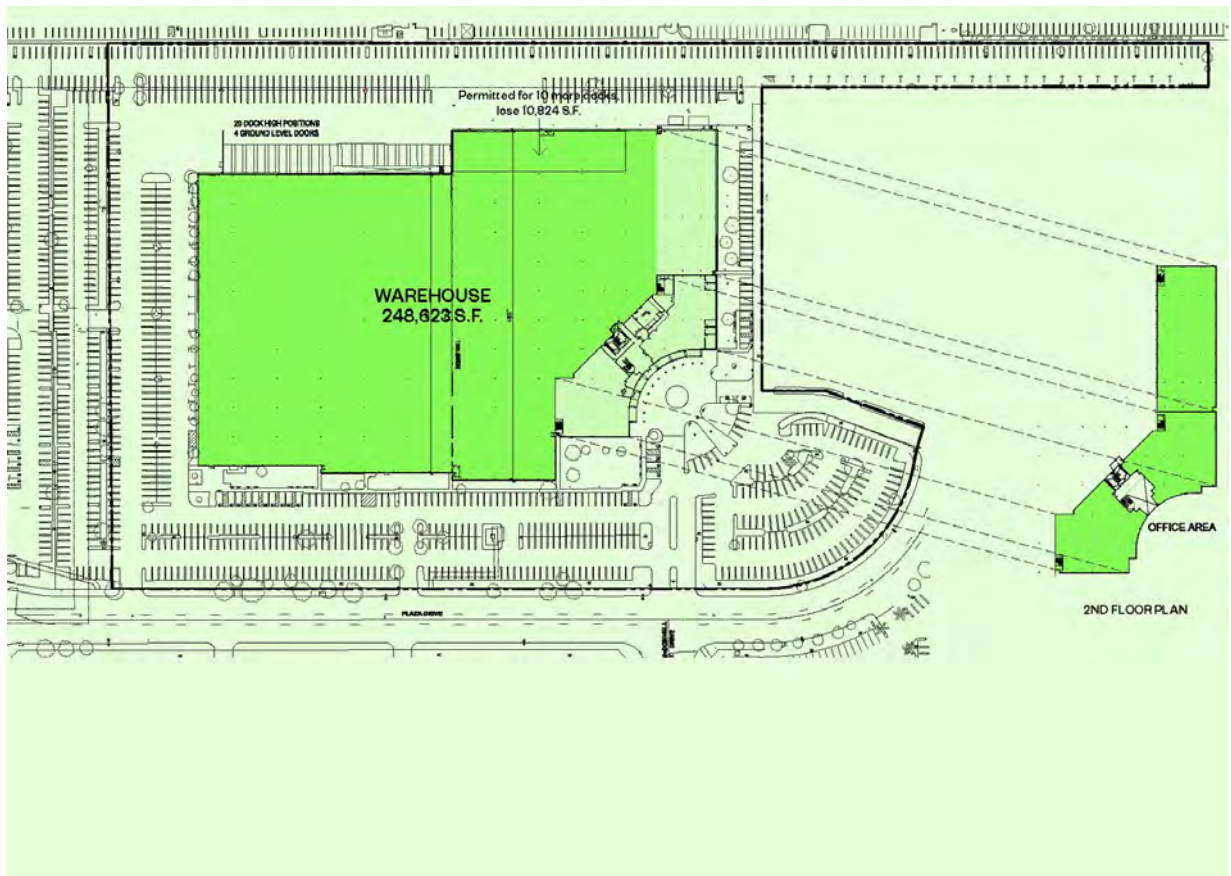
PRELIMINARY SITE PLAN
